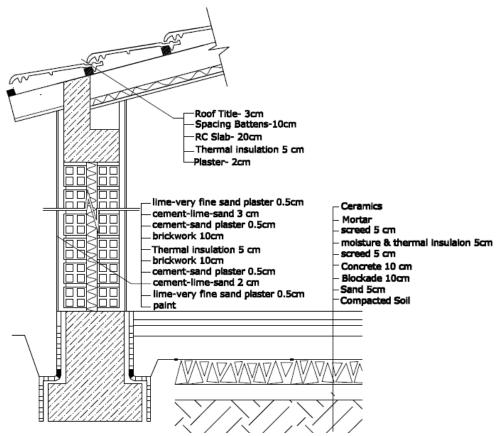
Construction Technique in Contemporary period- Brick wall- C4
